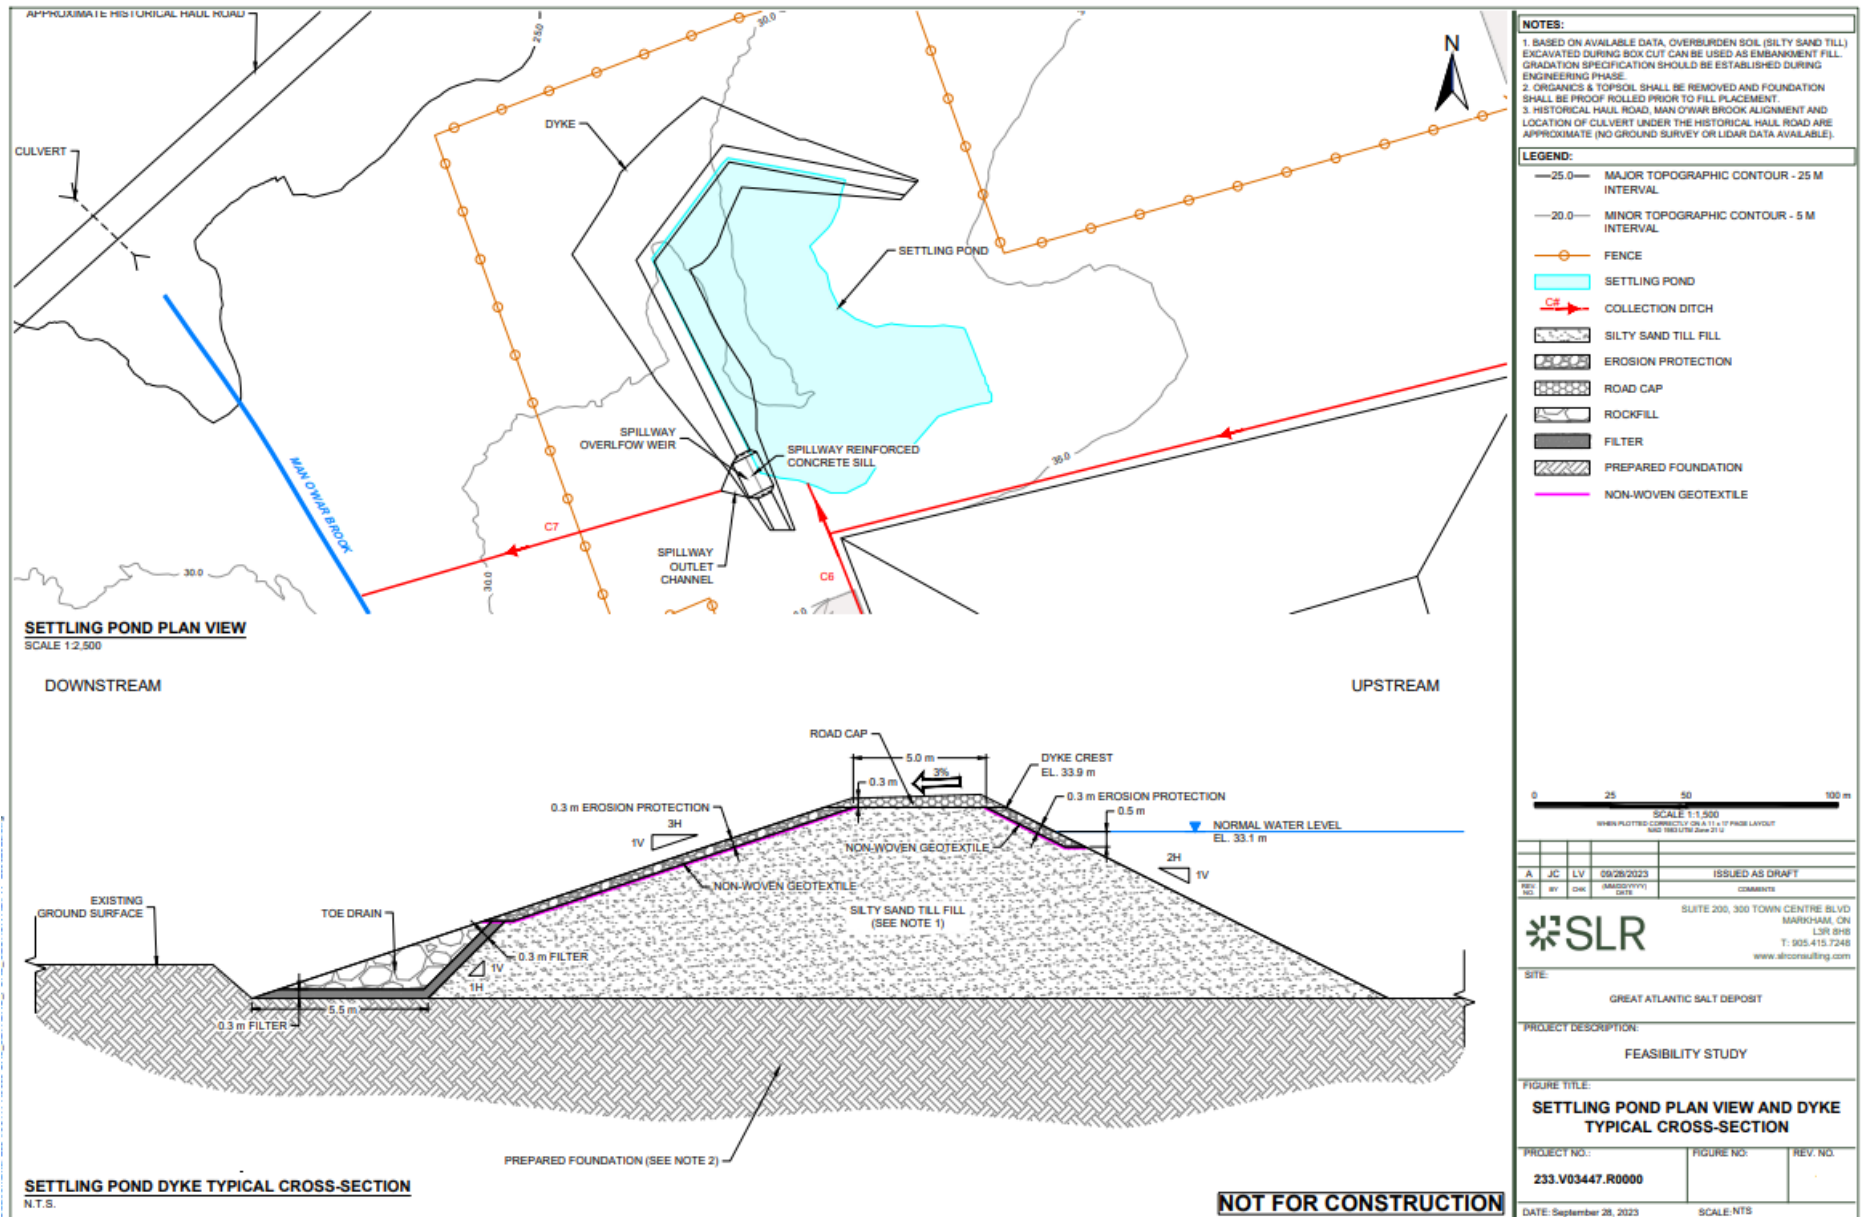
Settling Pond Plan View and Dyke Typical Cross Section
